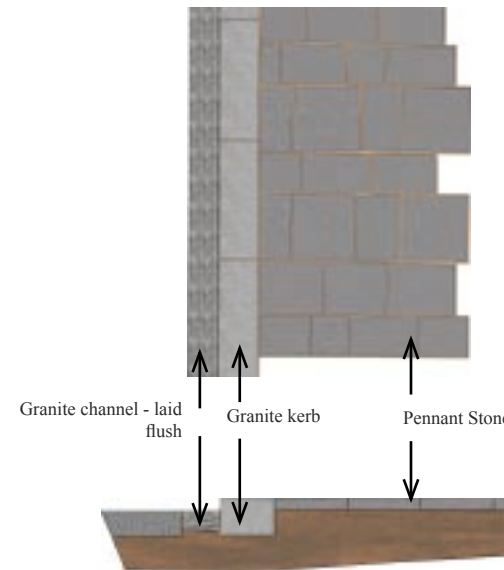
Broadmead streetscape detail to be adopted in Nelson Street
